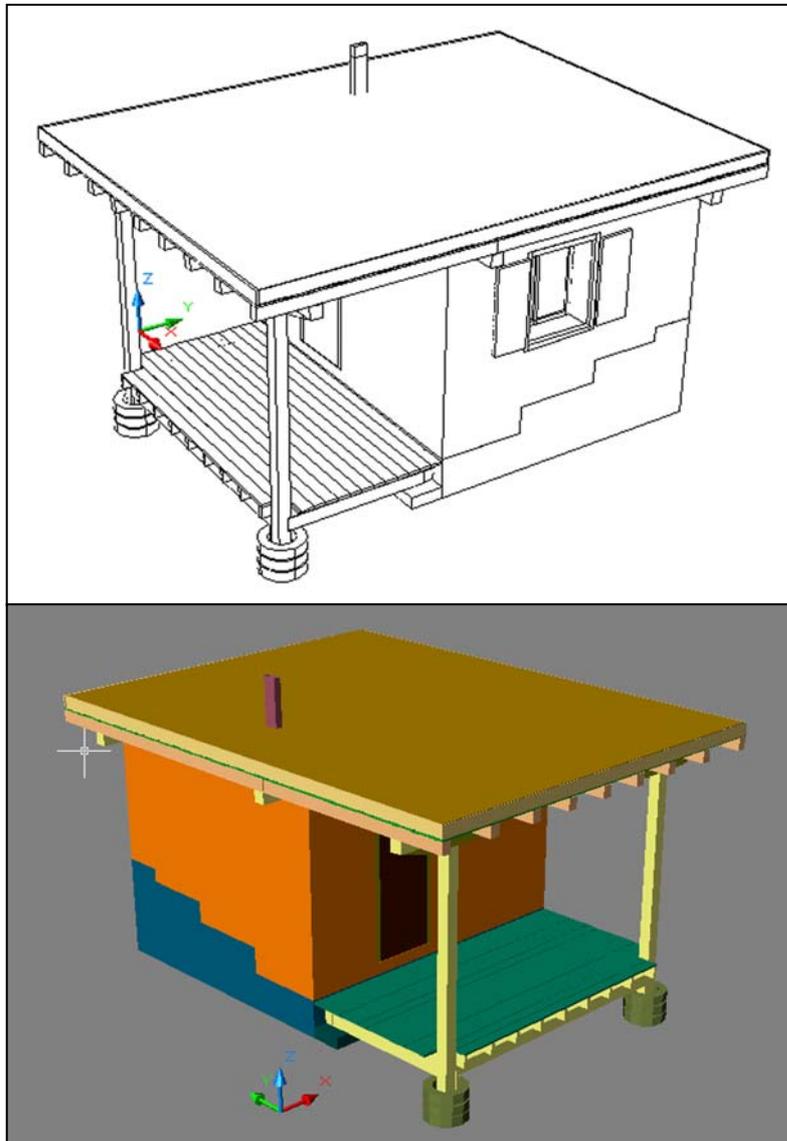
3D model (above) created in AutoCAD and then rendered (below).
